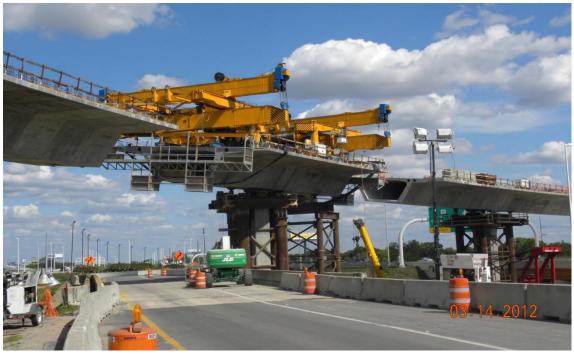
Photo. Precast segmental balanced cantilever bridge erection using a segment lifter.
